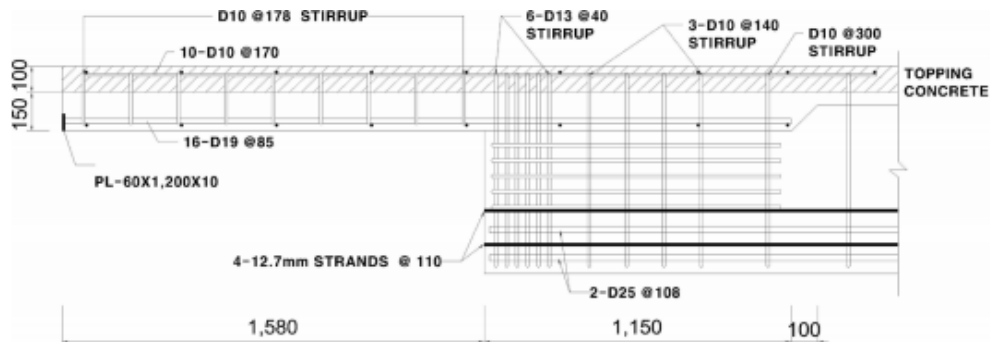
Sections of Single Tee Specimens (Yu et al. (1999))
